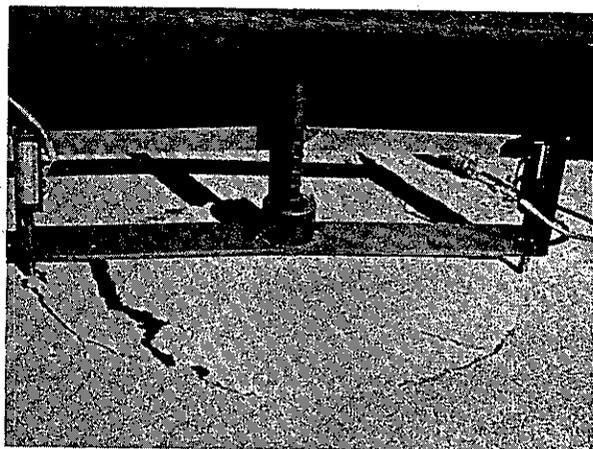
Steel bracket and potentiometers used to measure vertical movement of bonded rebars during pullout.
